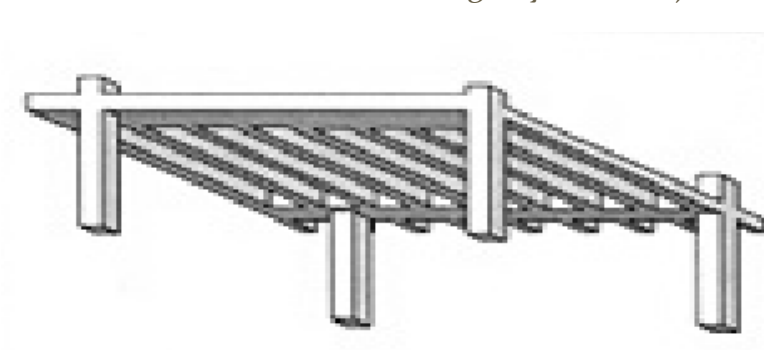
THIS FIGURE SHOWS THE LAYOUT OF A ONE-WAY JOIST SYSTEM. COURTESY OF THE CONCRETE REINFORCING STEEL INSTITUTE.
